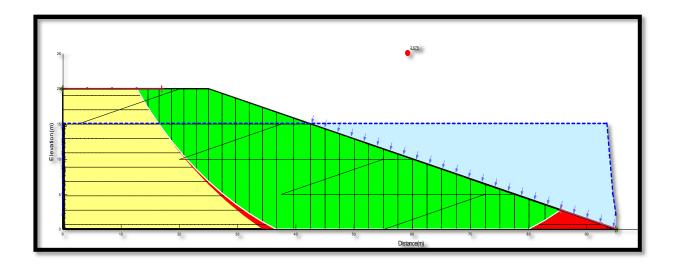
Embankment cross section for 1:3.5 slope at 15 m water level
